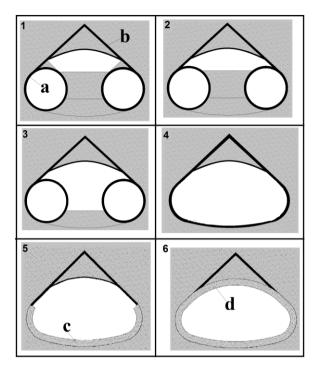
Construction stages of main underground space (a: TBM lining; b: piles; c: invert part of final lining; d: crown part of final concrete lining)
